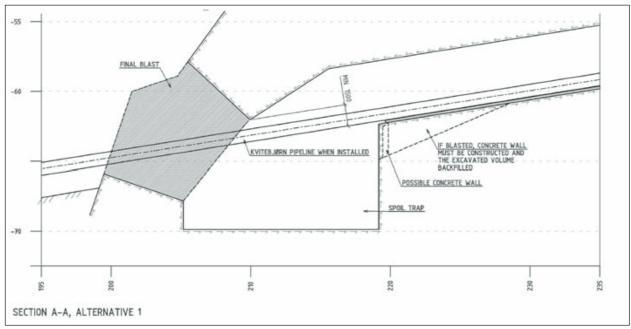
Alternative 1 - section view of preliminary underwater piercing blast round. (Illustration: Norconsult)
